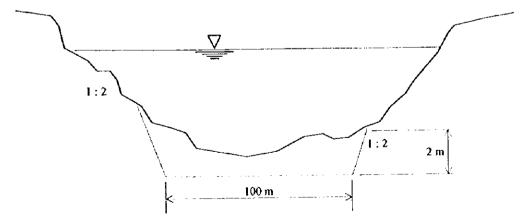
Standard Cross Section of Dredging (Sigatoka)
